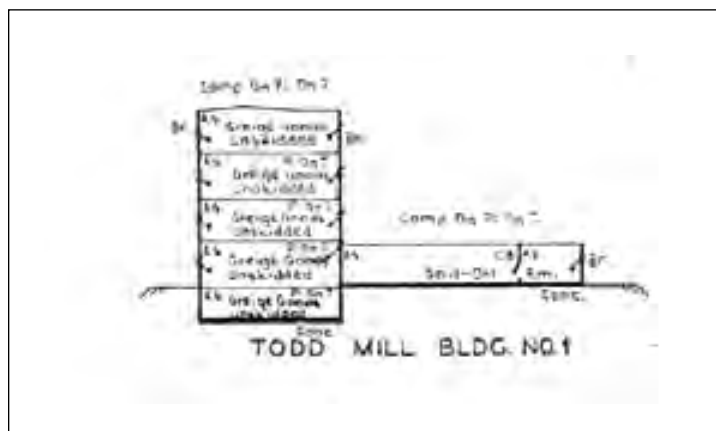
Factory Mutual Insurance Co. *Mill Realty Co.* 1965. West-east cross-section through Todd Building No. 1. Scale: 1 inch= 30 feet (approximately).
